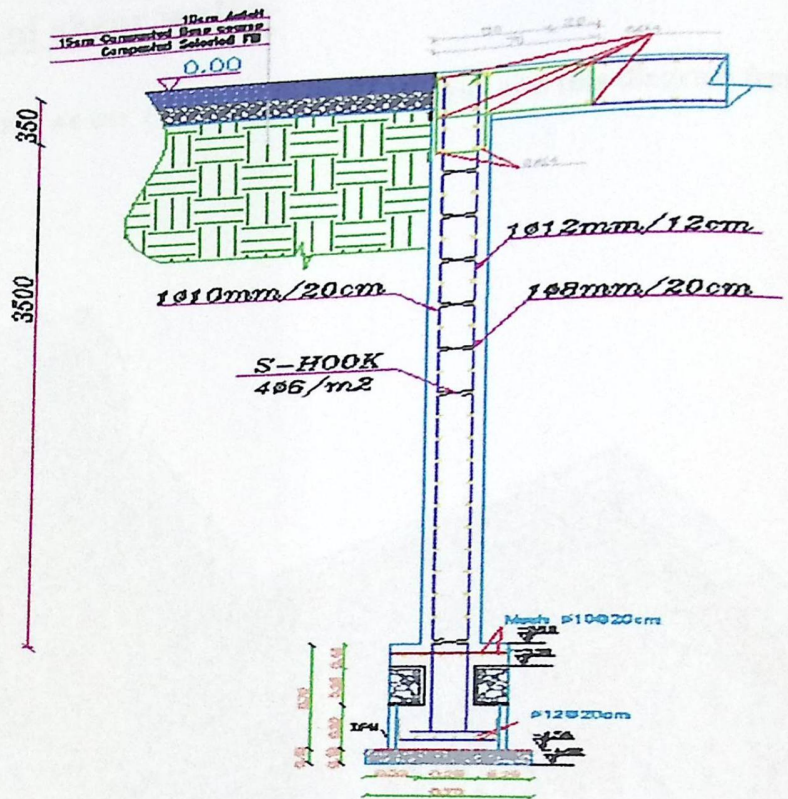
Reinforcement Detail of Basement Wall (BW1)
